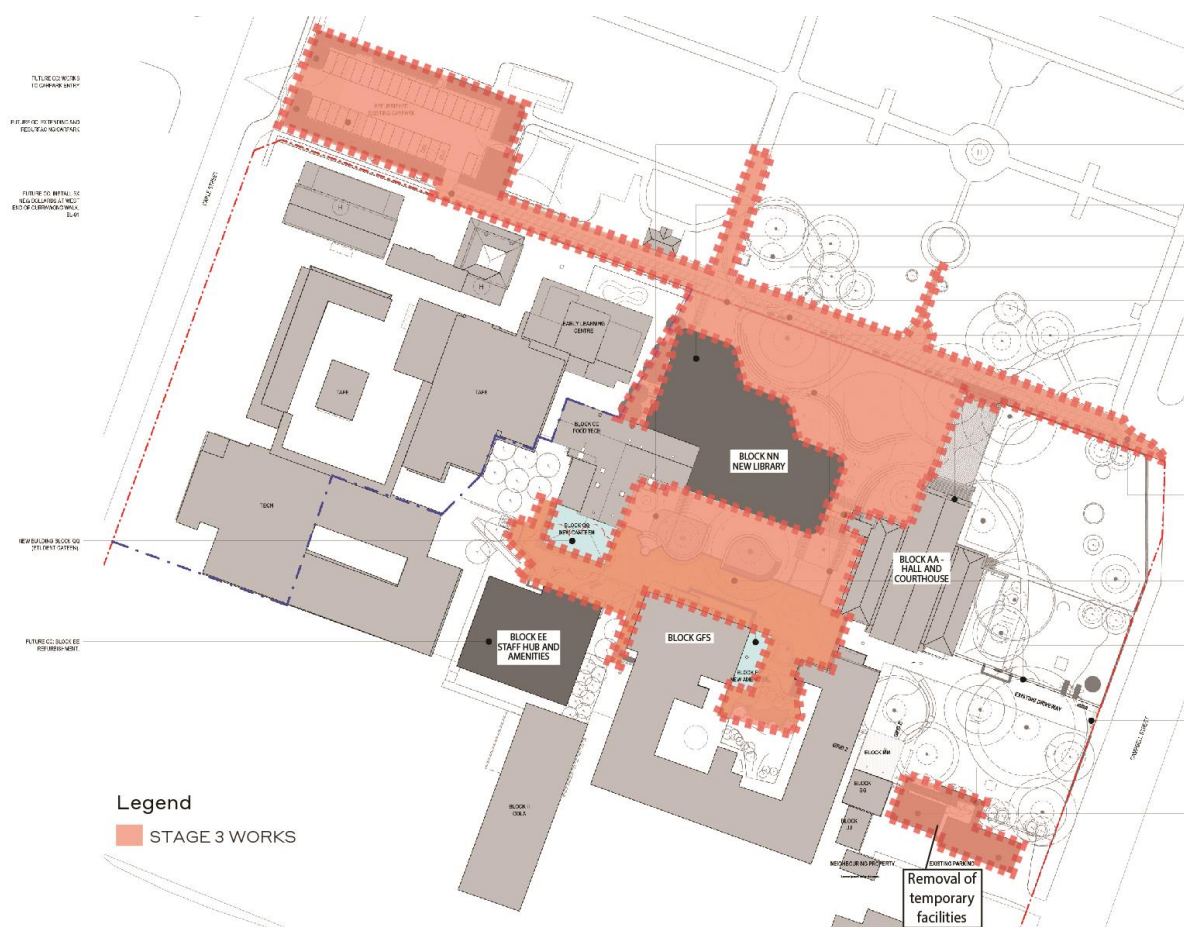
Extent of Stage 3 Works – Landscaping, Car Park and Temporary Facility Removal Works
